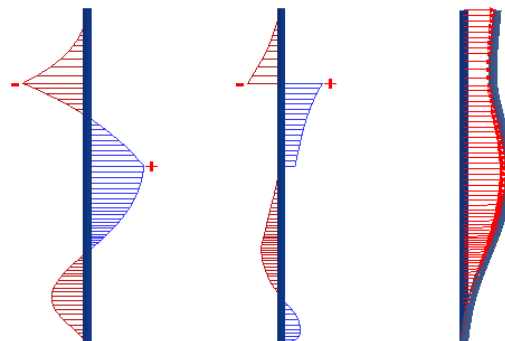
(a) Bending moment in the sheet pile (b) Shear force in the sheet pile (c) Deformation in the sheet pile, for Nieuw Delft in the Earthquake load case, where GWT = LAT
